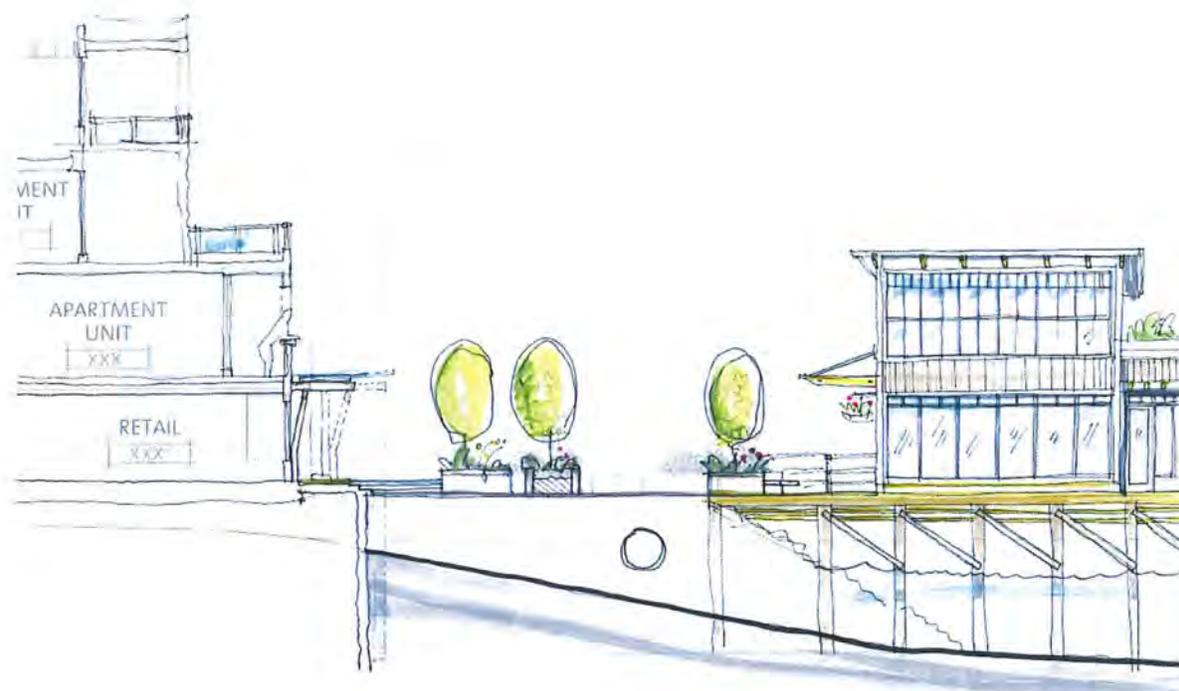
Cross section showing waterfront walkway and adjacent uses (drawing A9.0.3c)
